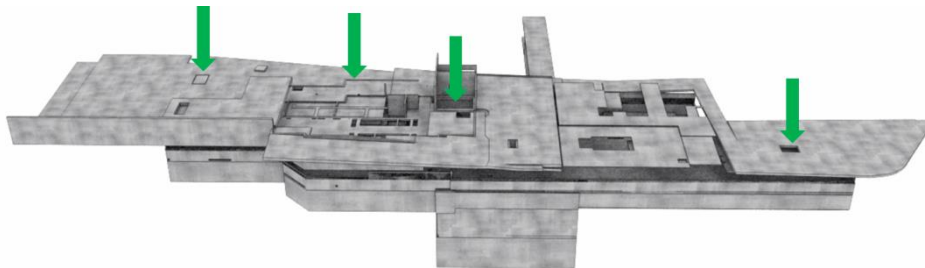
Basement MEP access opportunities utilising plant replacement plans, and temporary openings in car stacker location. Final plant sizing and equipment choice will dictate final arrangements
